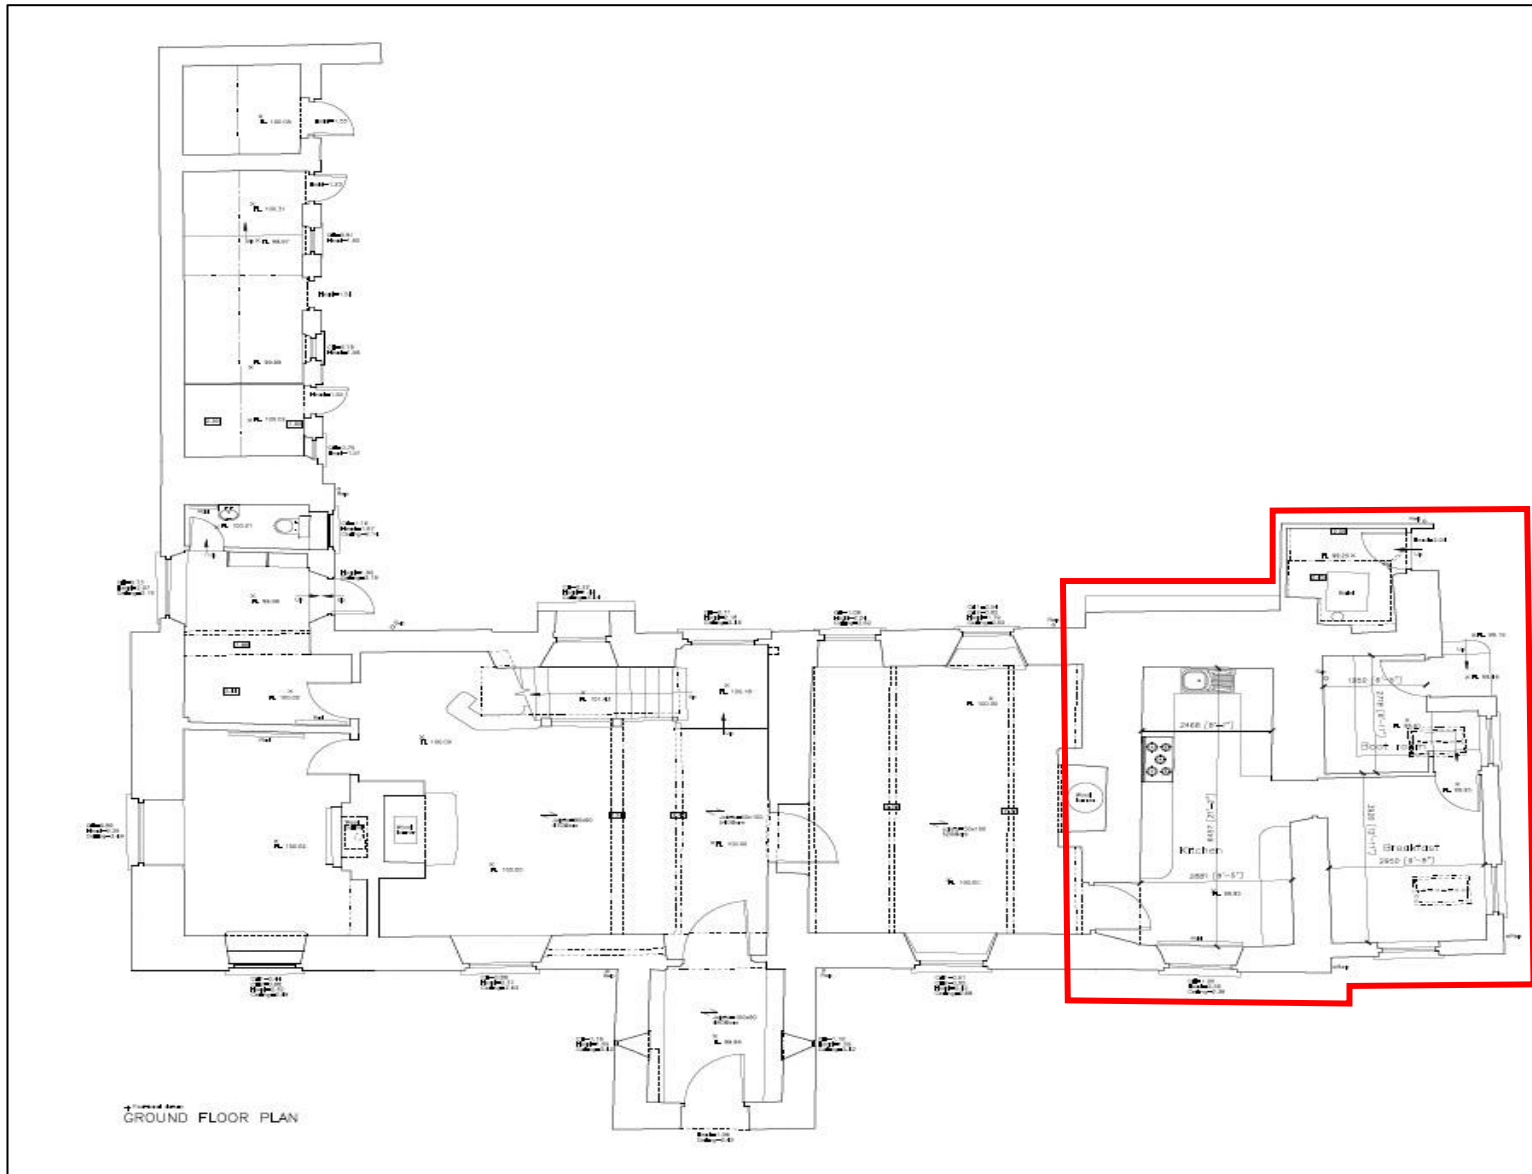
EXTRACT OF THE PROPOSED FLOOR PLANS, AS PROVIDED BY AGENT (CADWORKS SOUTH WEST LTD) 2024.
